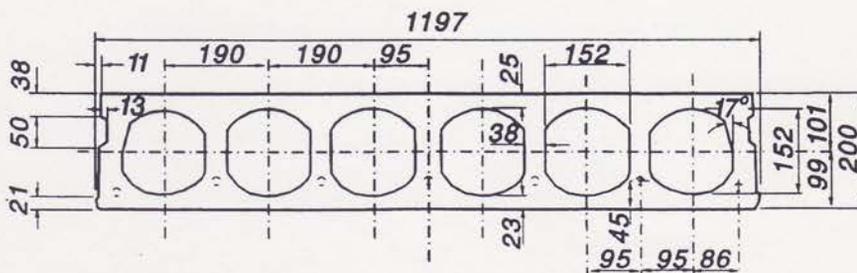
Fig. A Dimensions of the Precast Concrete Hollow-Core Unit Used in the Tests
